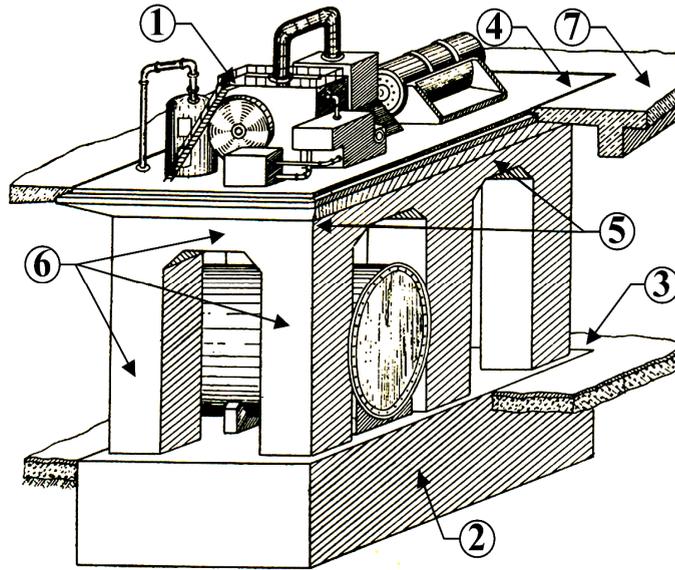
Framework foundation for machine (Kral 1973); 1 – the machine, 2 – bottom slab of the foundation, 3 – bottom floor of the room, 4 – top slab of the foundation, 5 – longitudinal beams, 6 – transverse frames, 7 – ceiling of the machine hall
